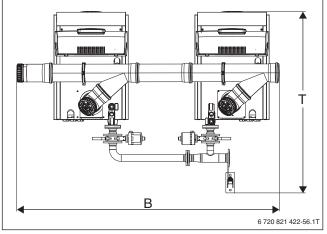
2-boiler cascade, lane installation (dimensions → Table 30, page 79)
